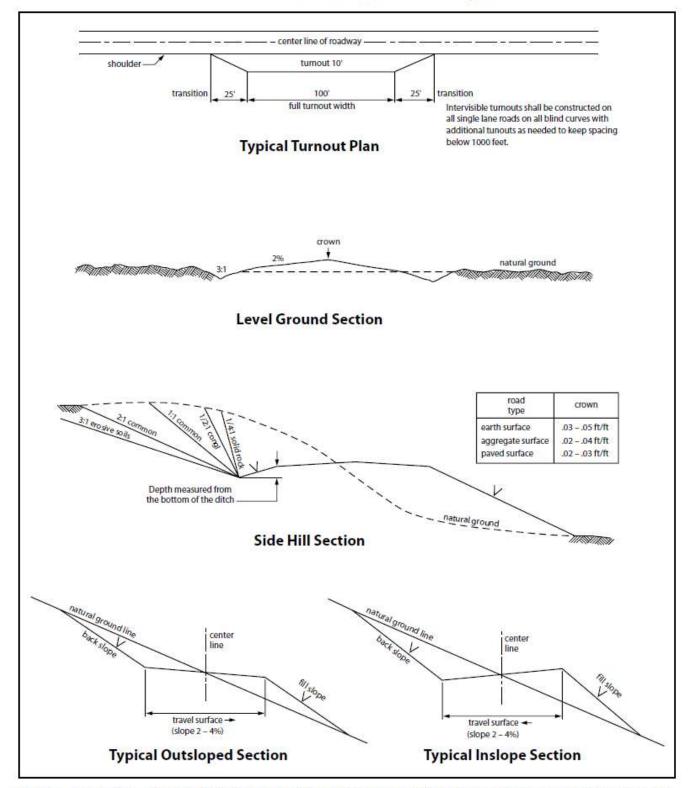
Cross-sections and plans for typical road sections representative of BLM resource or FS local and higher-class roads.
